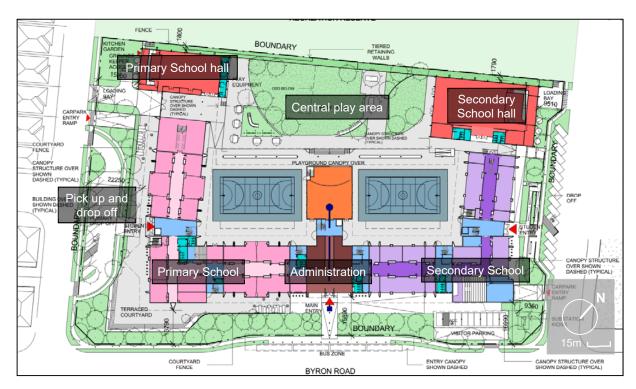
| Proposed Amity College layout (Source: Applicant's EIS 2019)
